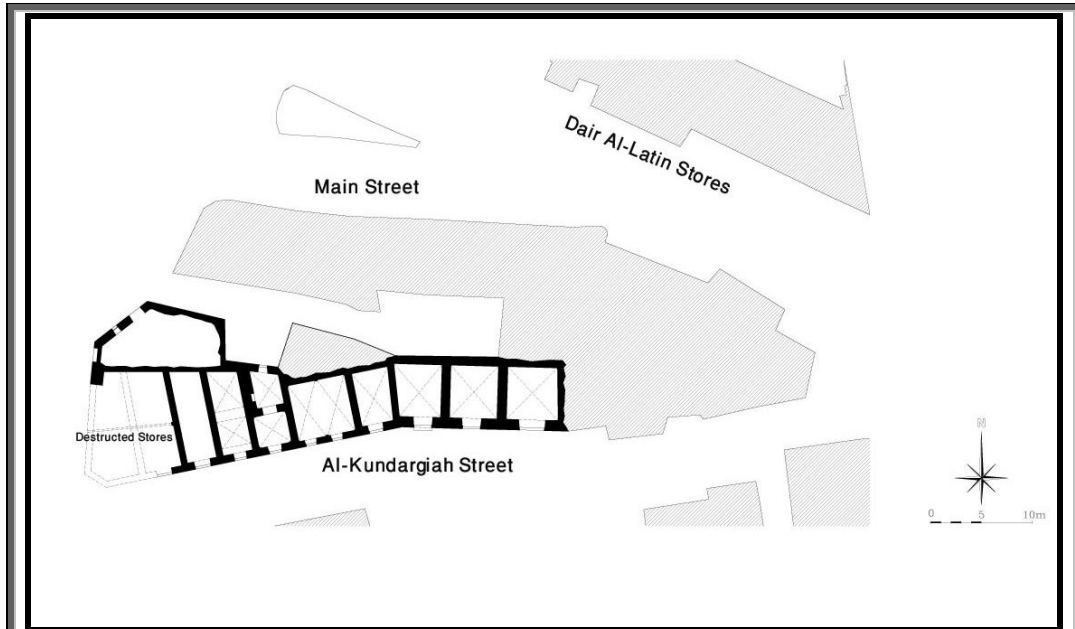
Commercial Stores, Al-Kundargiah Street, Ramallah.
